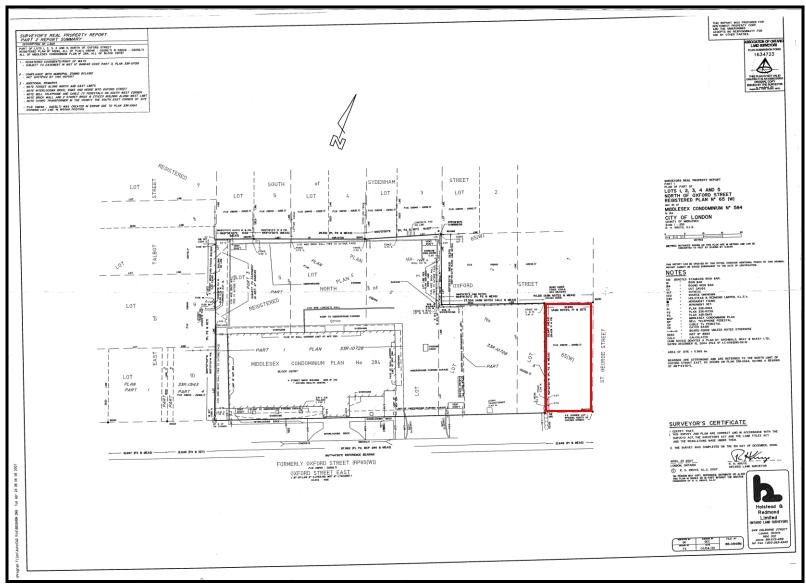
Site Plan Illustrating the Project Location (Holstead & Redmond 2007)
